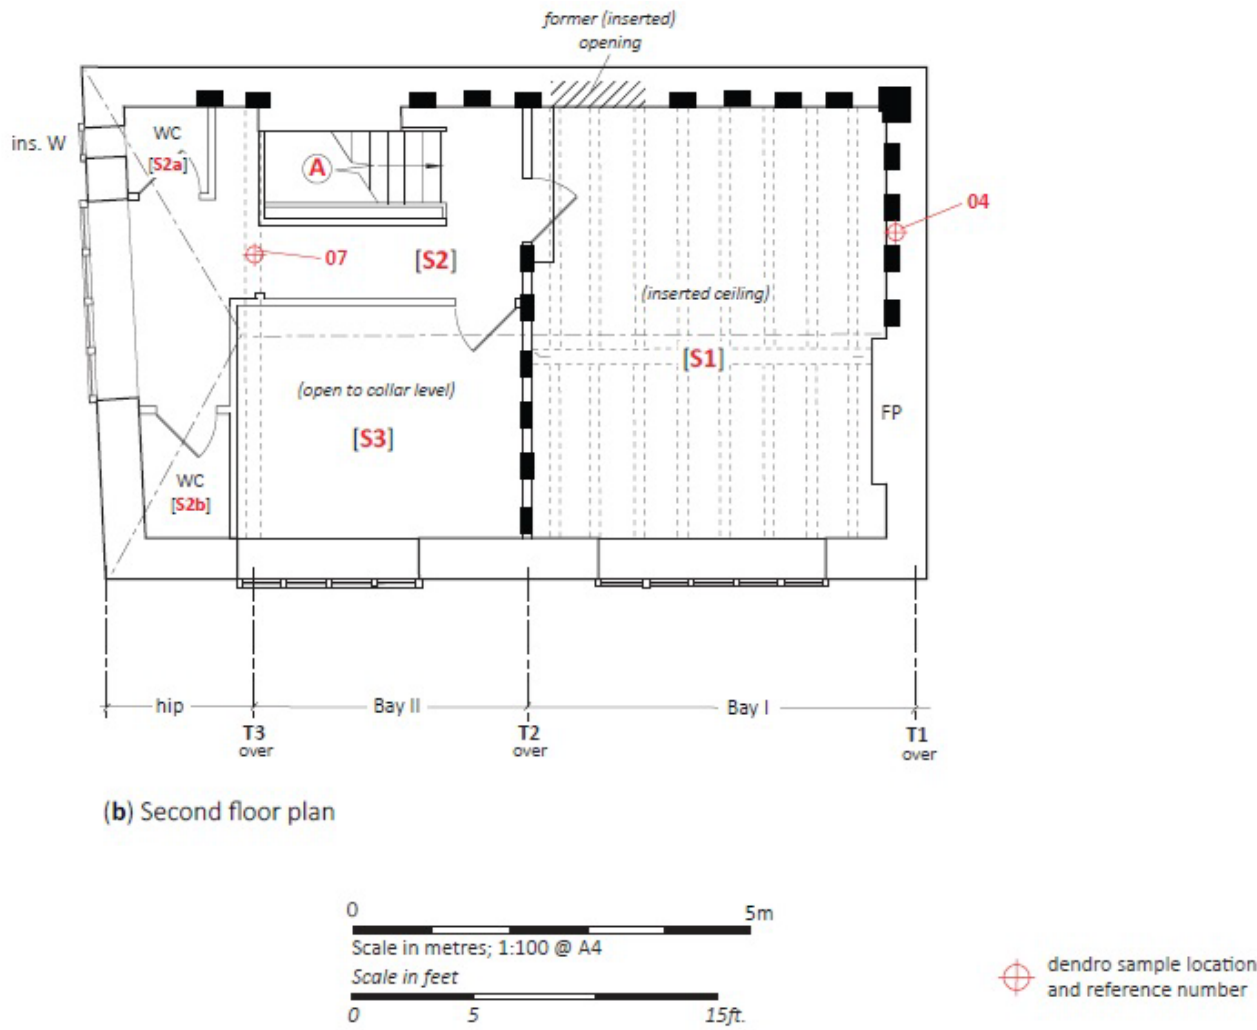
Second-floor plan showing the location of two samples taken for dendrochronology [adapted from an original drawing by Ric Tyler]
